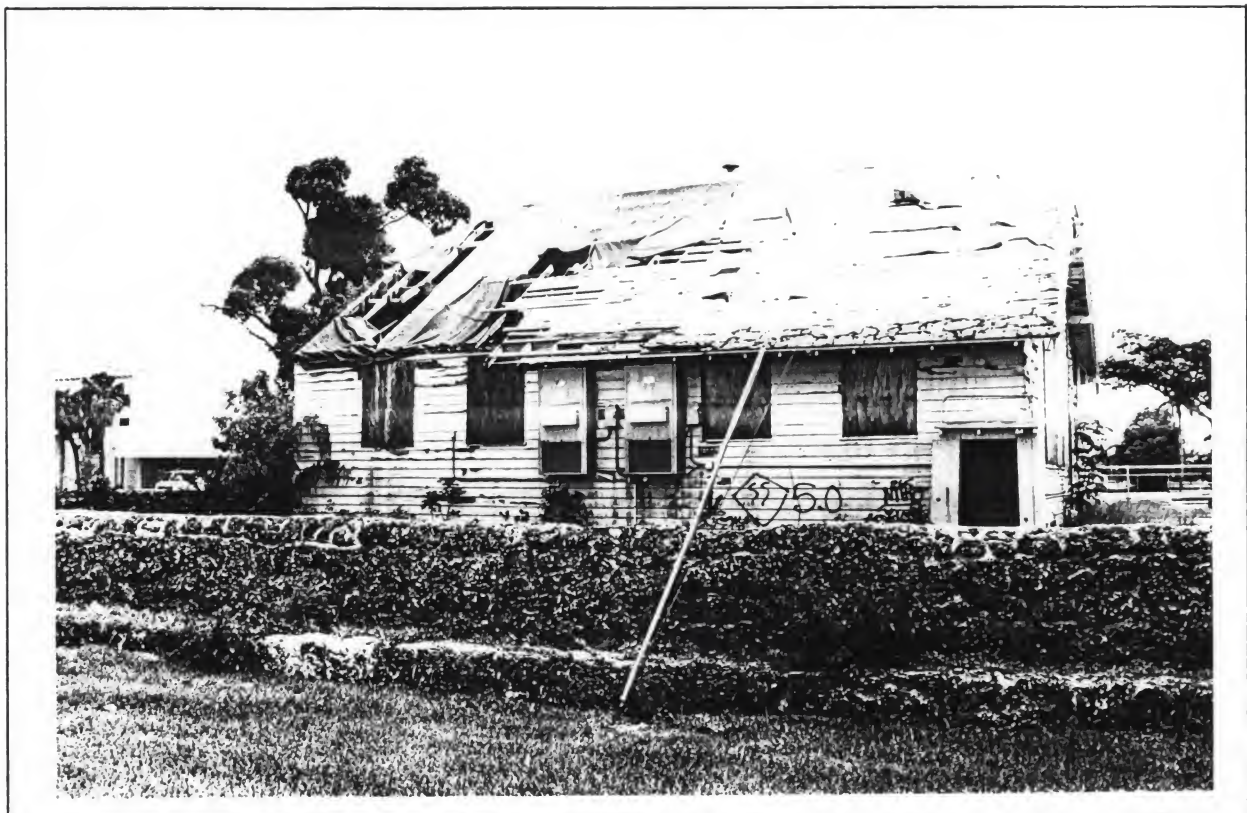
AGRICULTURE BUILDING, NORTH (REAR) ELEVATION.
